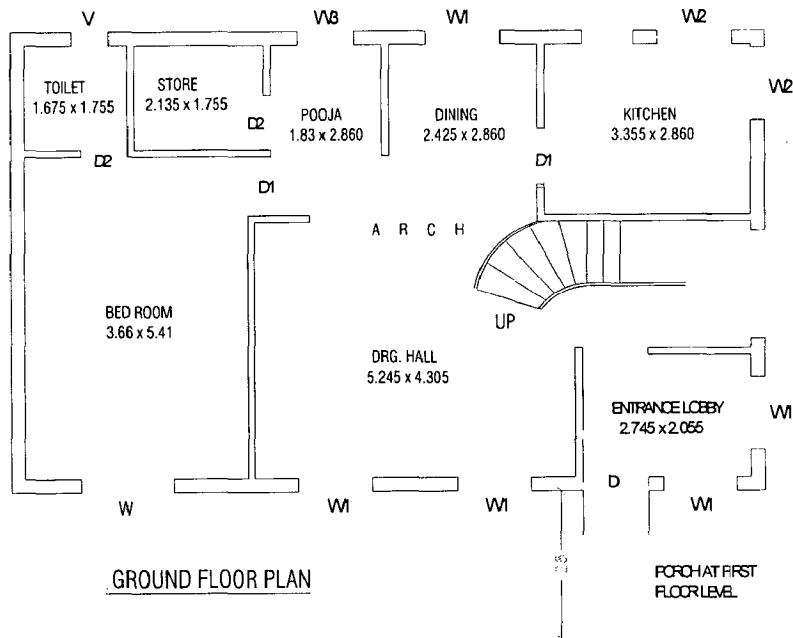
FLOOR PLANS OF CASE STUDY 5
